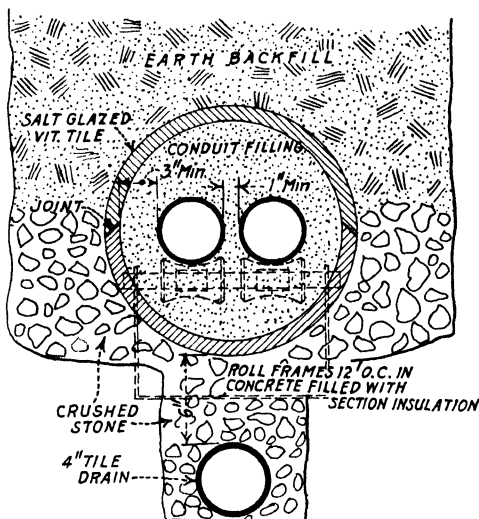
CONDUIT FOR CENTRAL STATION HOT-WATER HEATING SYSTEM.
